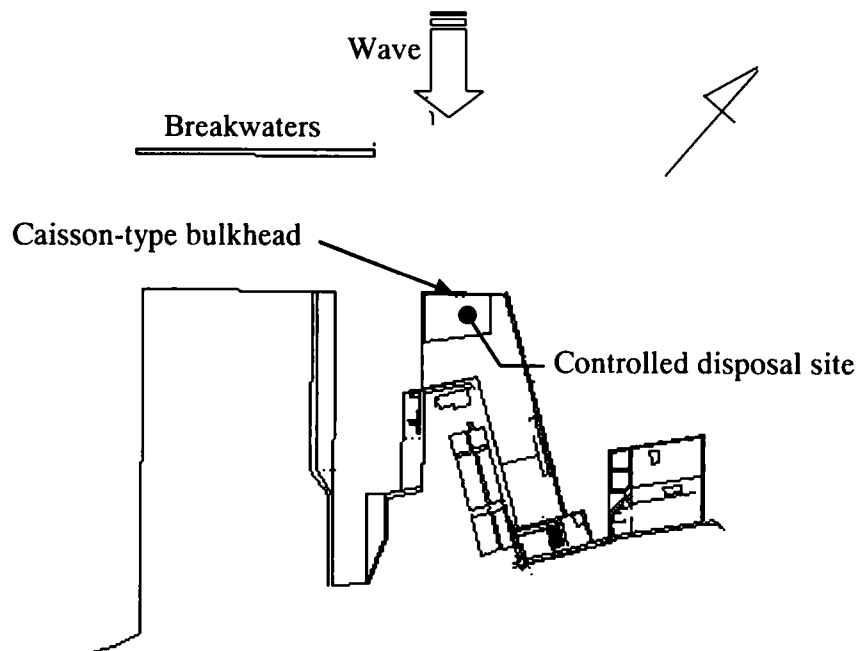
Plan view of controlled disposal site in Shikoku-Chuo city (Kotake et al., 2004c)
